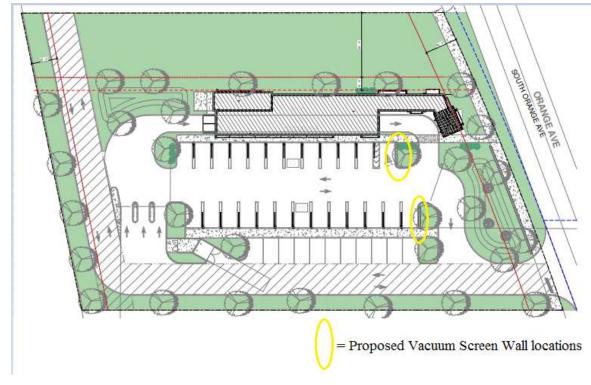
Proposed Vacuum Screen Wall Locations
